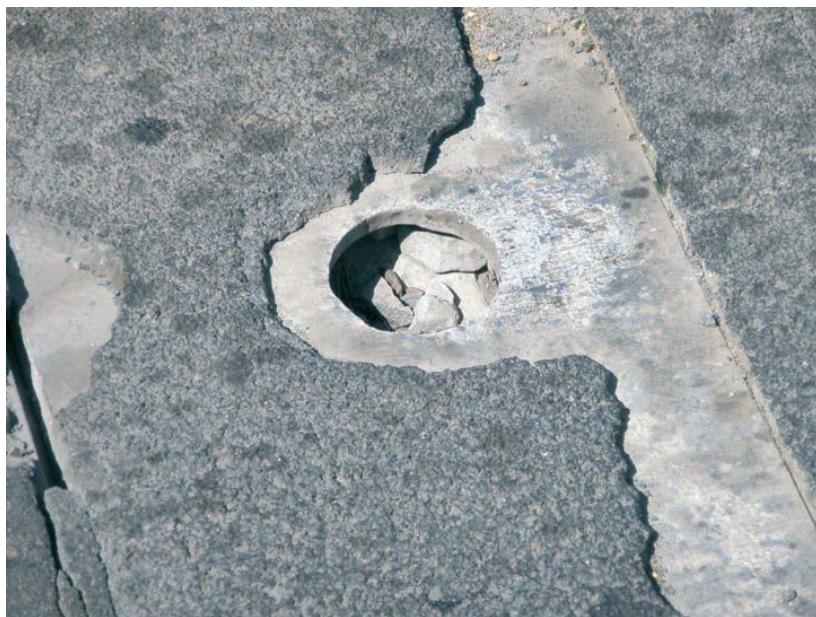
Failure of grout around the shear stud connection in study case of "Old Youngs Bay bridge" (Bottenberg 2010)
